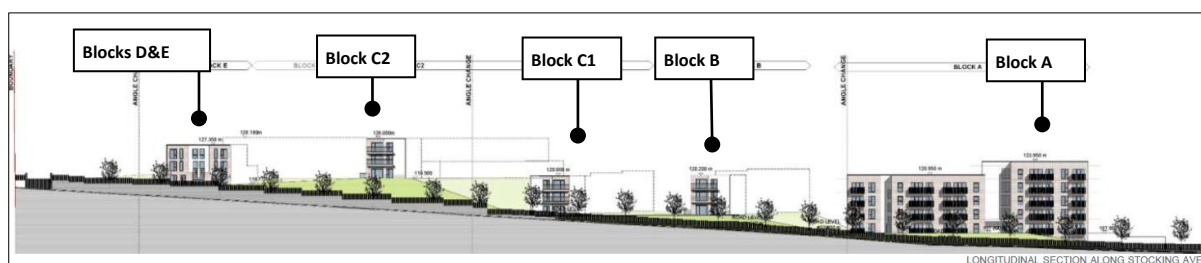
Contiguous Site Section, Stocking Avenue, (Source: RAU Drawing No. P1-153D).
